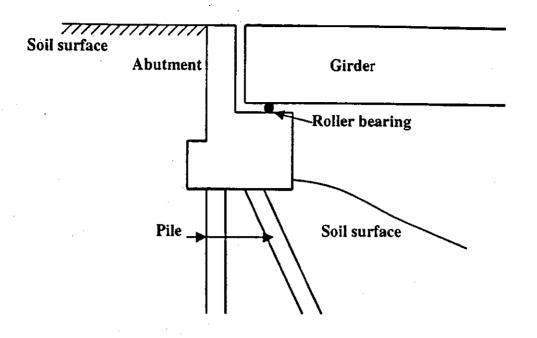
Typical Non-Integral Bridge Abutment Supported on Piles
